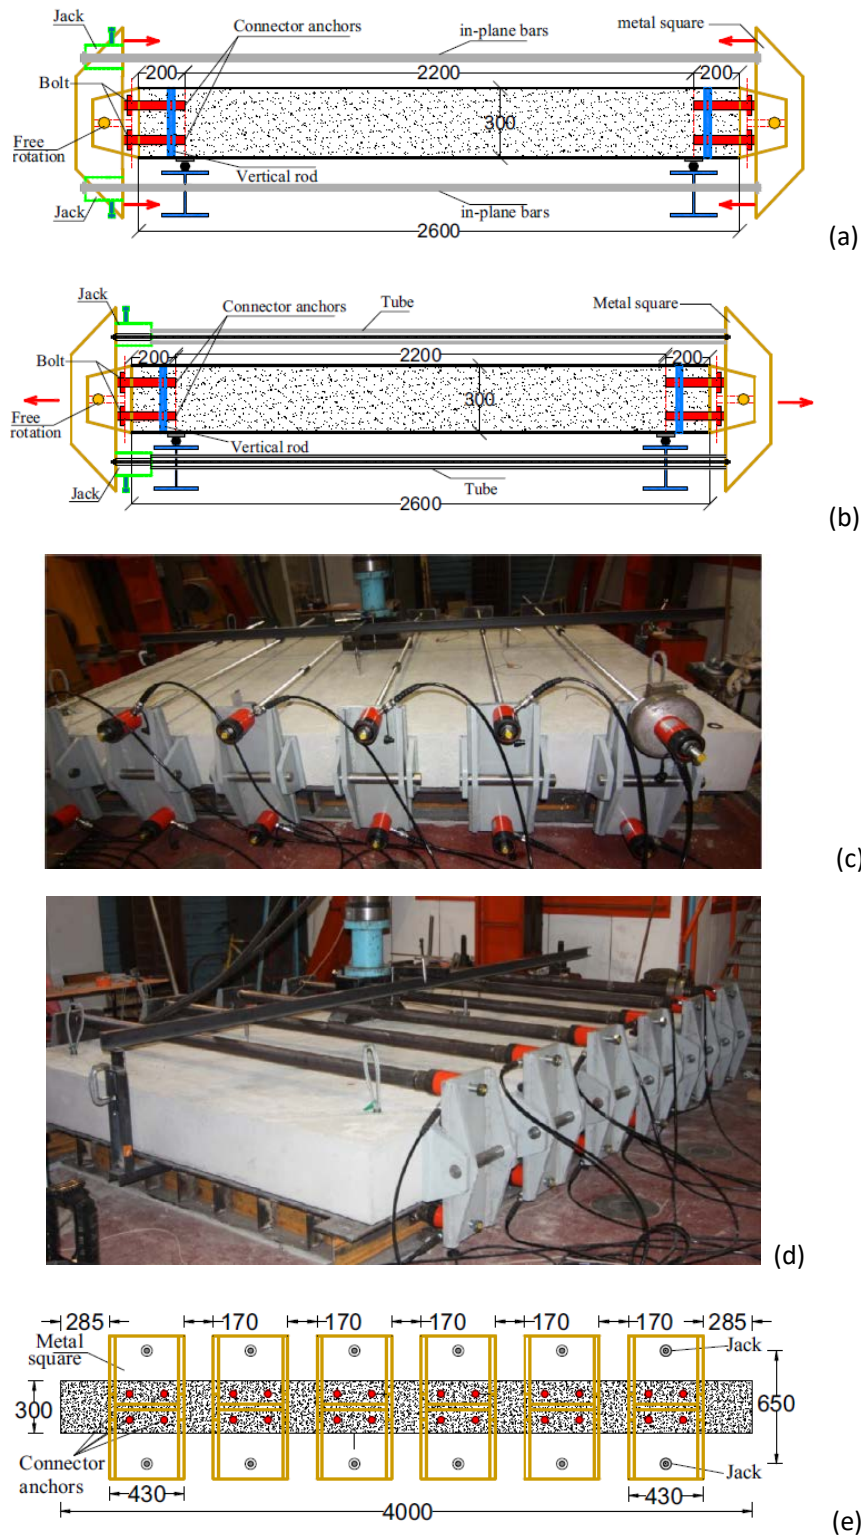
Loading system: a) transverse section of compression; b) transverse section of tension; c) setups of compression; d) setups of tension; e) horizontal section. Units: [mm] (Figure 4, Bui *et al.*, 2017) [mm]
